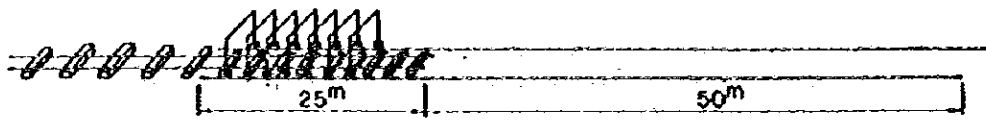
Construction Method by Using Temporary Work Rail
